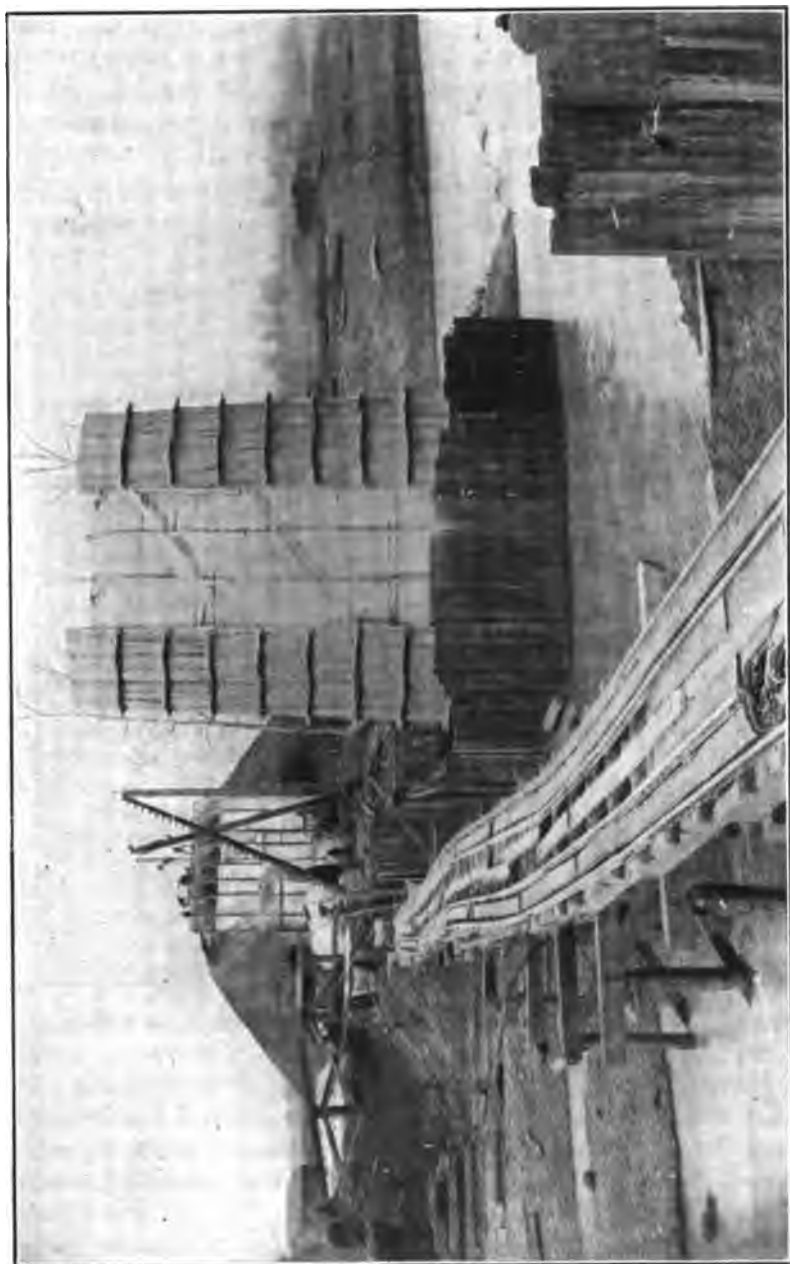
COFFER-DAM, C. B. & Q. RY., WITH FRIESTED PILING
